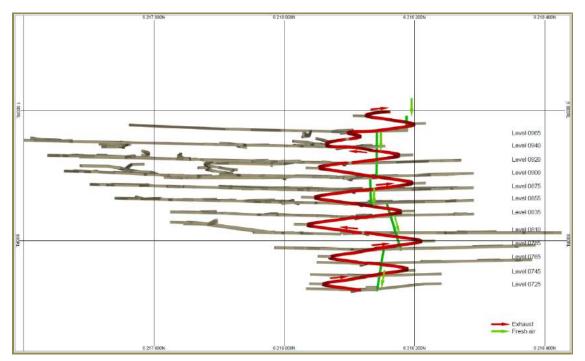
Ventilation Network Overview Silver Coin (Looking East)
